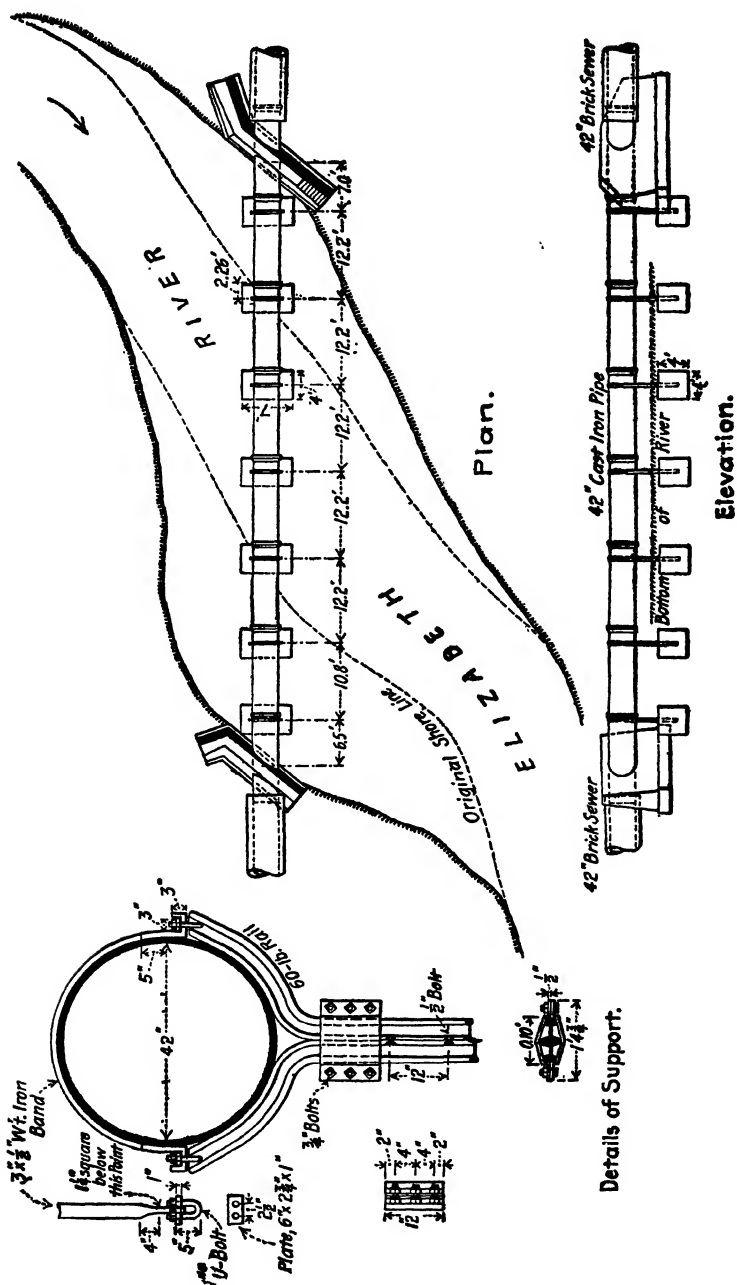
Sewer bridge, joint outlet sewer, New Jersey.
